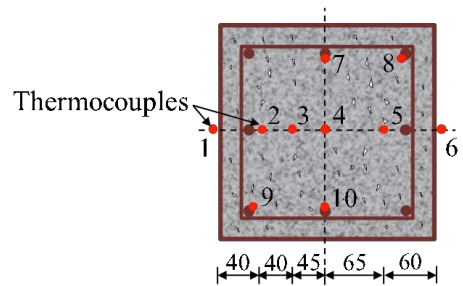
Schematics of TRC column and TRC column-RC beam connection
